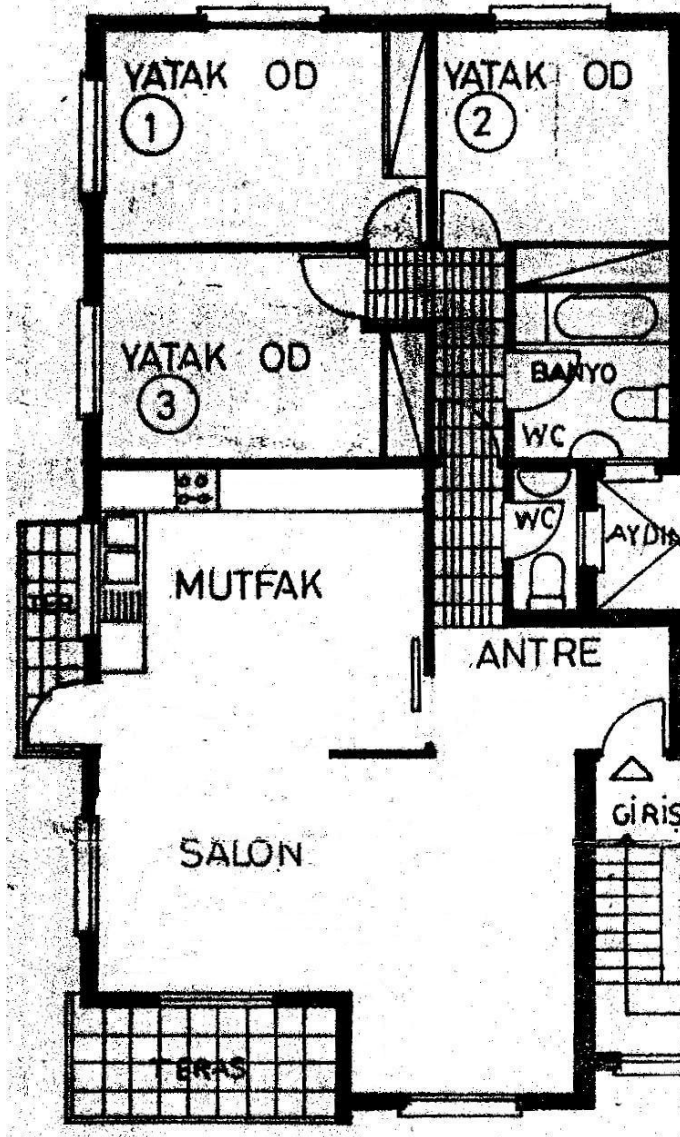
Typical floor plan by Noyanlar Construction, 1997.
